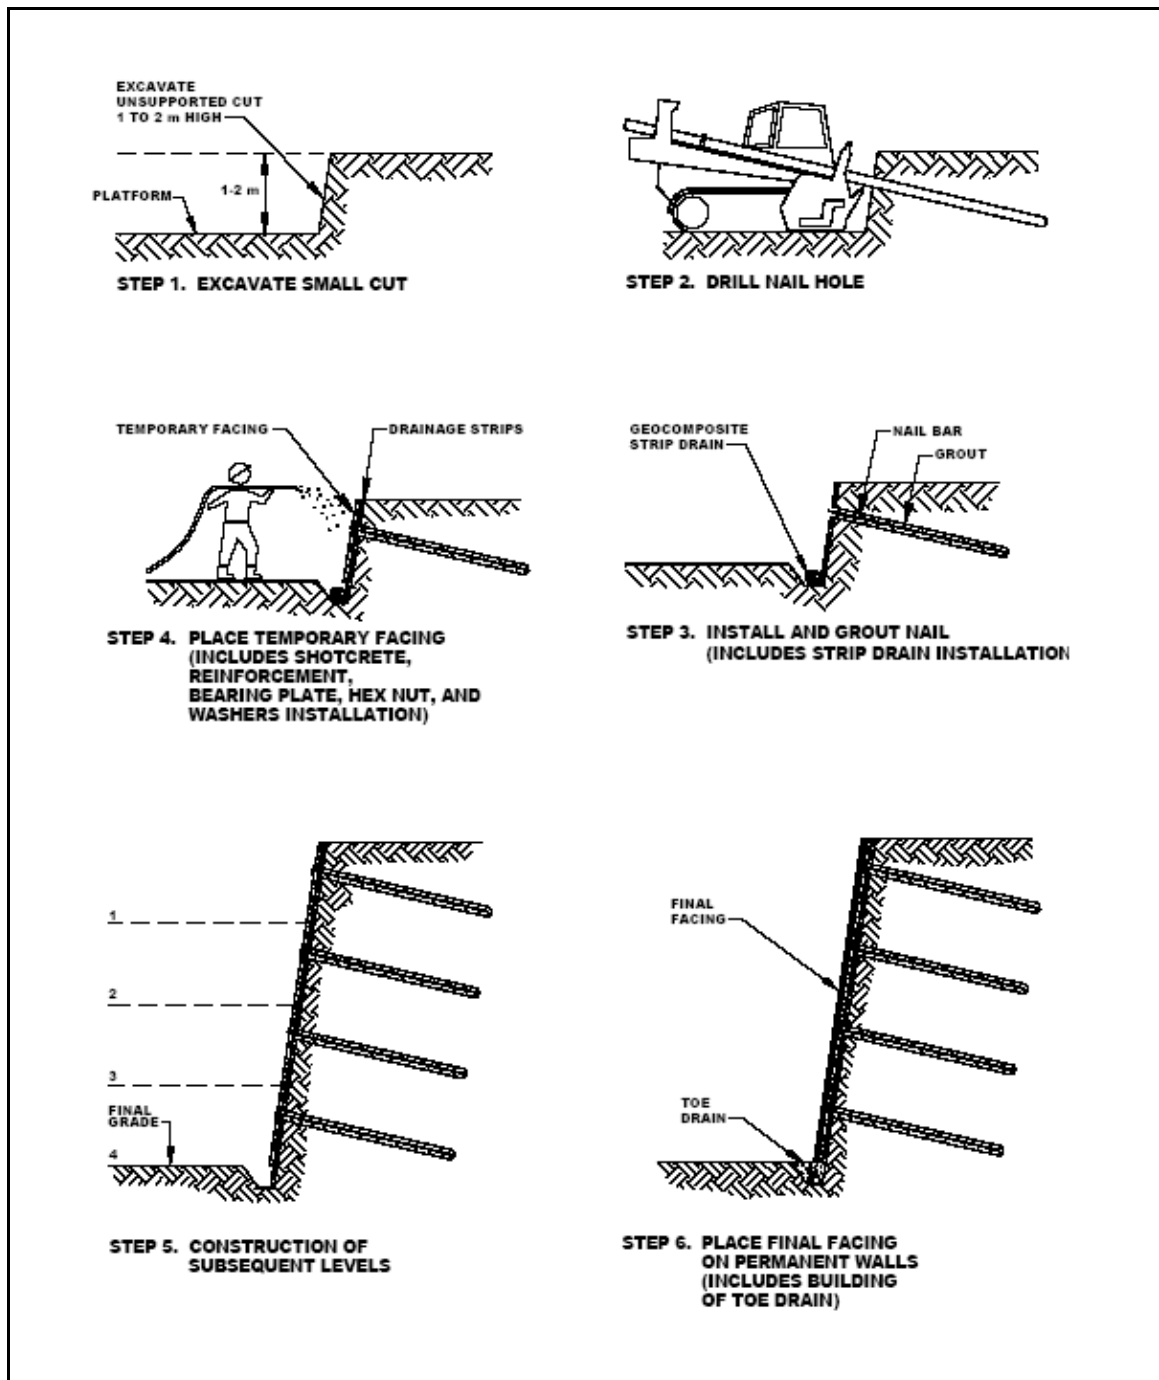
A typical construction sequence for a steep soil nail wall (FHWA, 2003)
